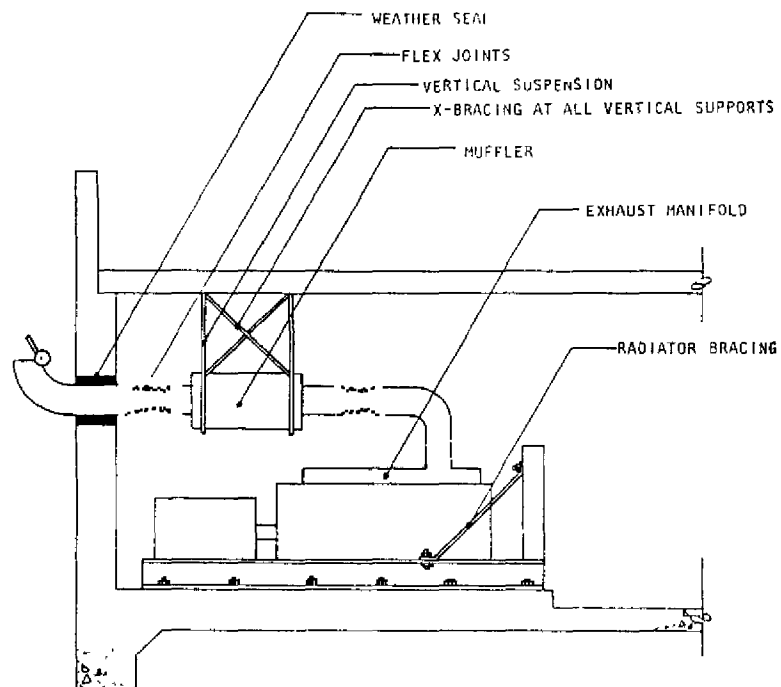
Emergency power supply systems. Muffler installation showing flexible connections, cross bracing, and bracing to radiator
